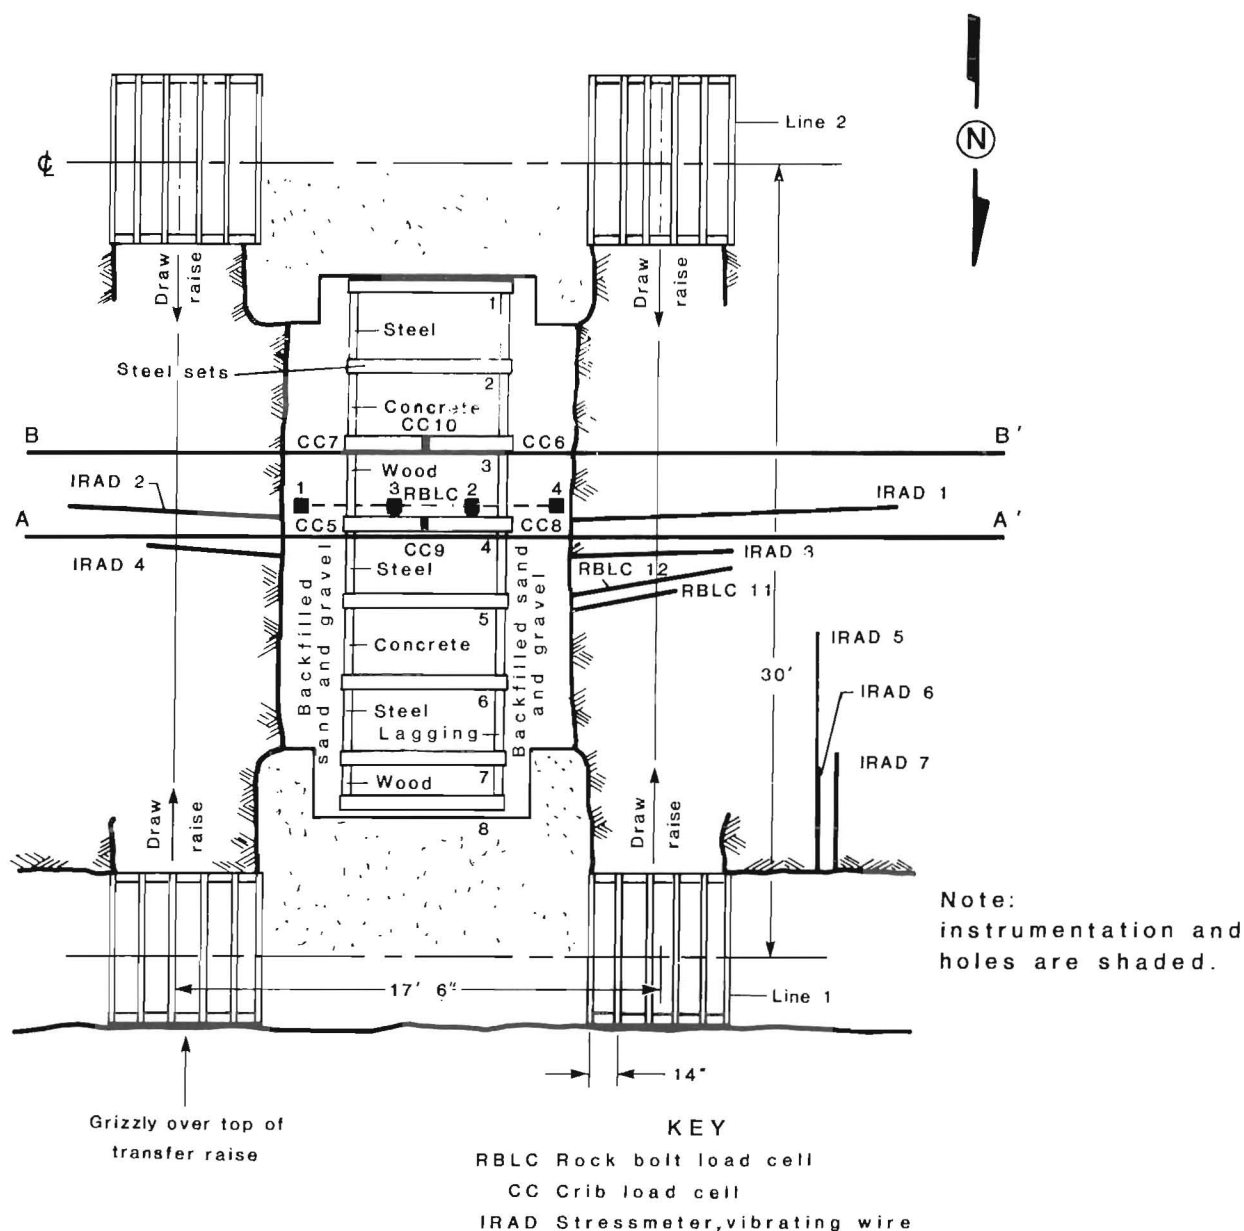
Instrumentation plan for test drift, 2315 grizzly level.
